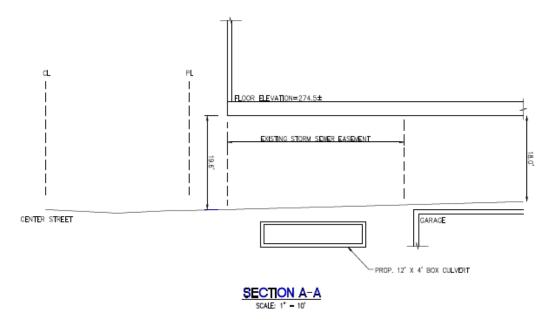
Section A-A from Sheet P-0301A from the applicant's concept plans
